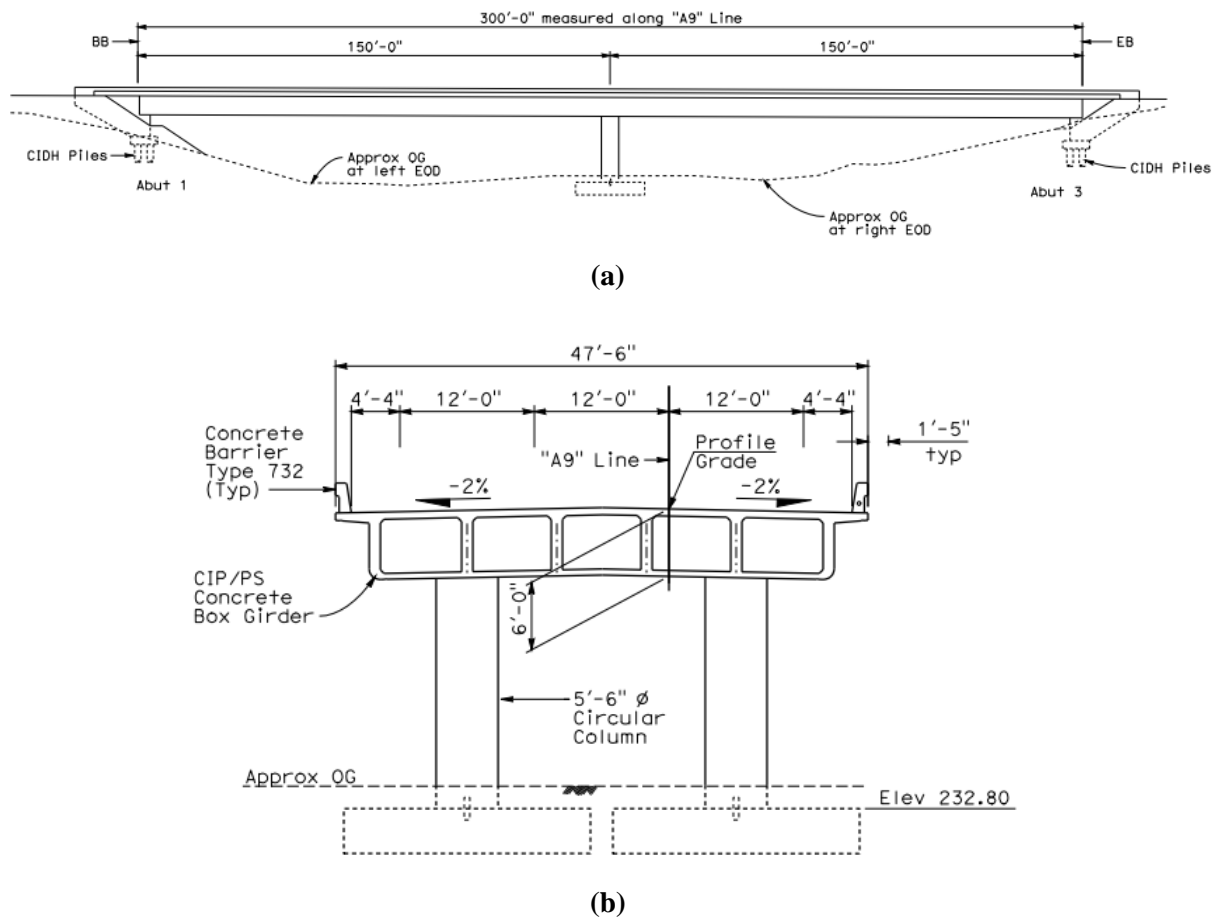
Caltrans ordinary standard bridge 1: (a) elevation (b) bridge bent at the center of the bridge span (note: unit = ft; OG = original ground; EOD = edge of deck; CIP = case in place; PS = prestressed)
